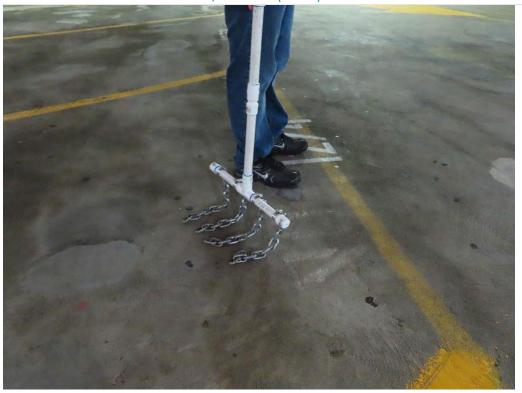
Concrete delamination, Pier level (SH2-21)
